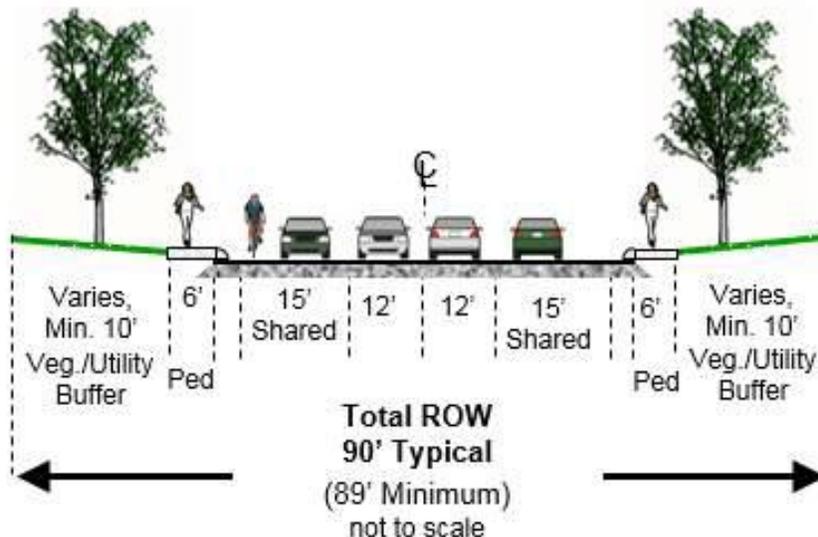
Typical Cross-Sections—Minor Arterials
